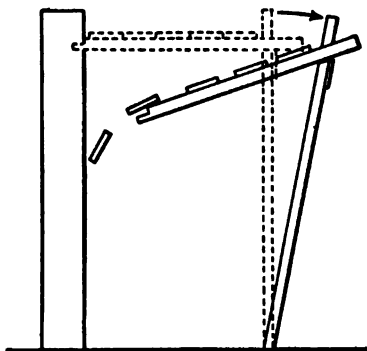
FAILURE BY FALLING AWAY FROM THE BUILDING.
